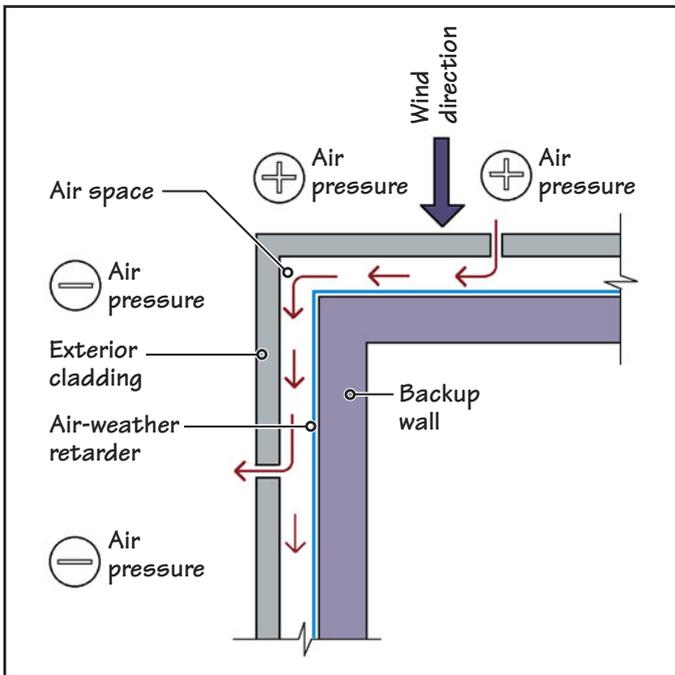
Because wind produces positive pressure on the windward wall and negative pressure on other walls of a building, the air in a continuous air space will circulate and move in and out through weep holes and other openings (joints, cracks, etc.) in the cladding. This makes it impossible to achieve pressure equalization between the outside and the air space.
